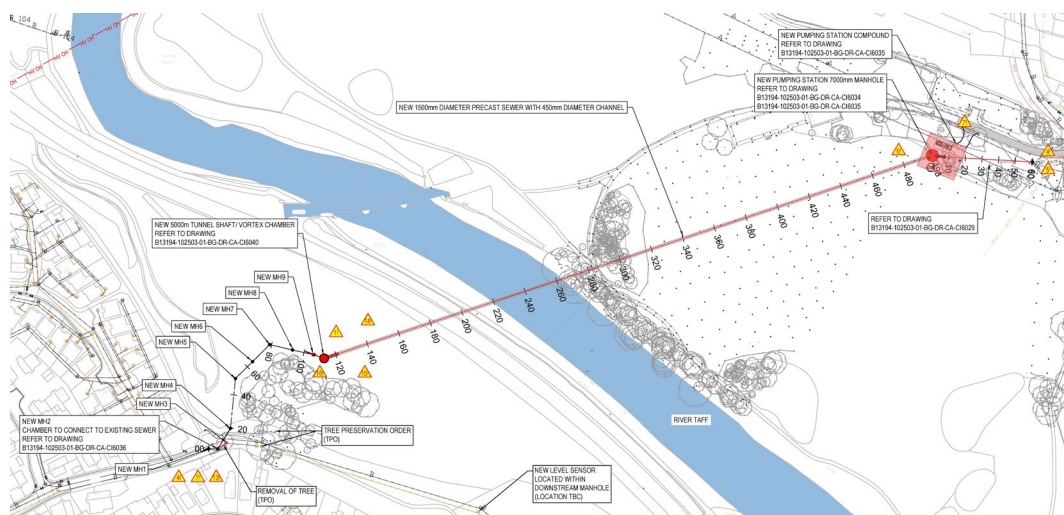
Gravity Sewer Plan – De Braose Close to Hailey Park
